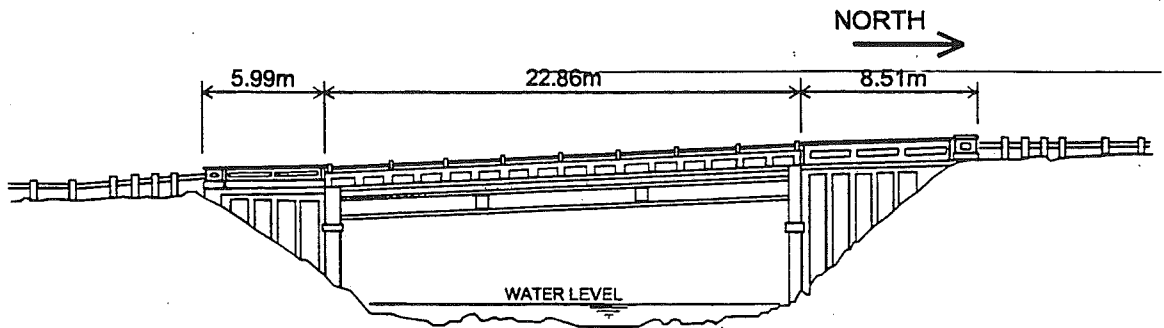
Elevation of the Bridge M19/MC (B04-77012).
